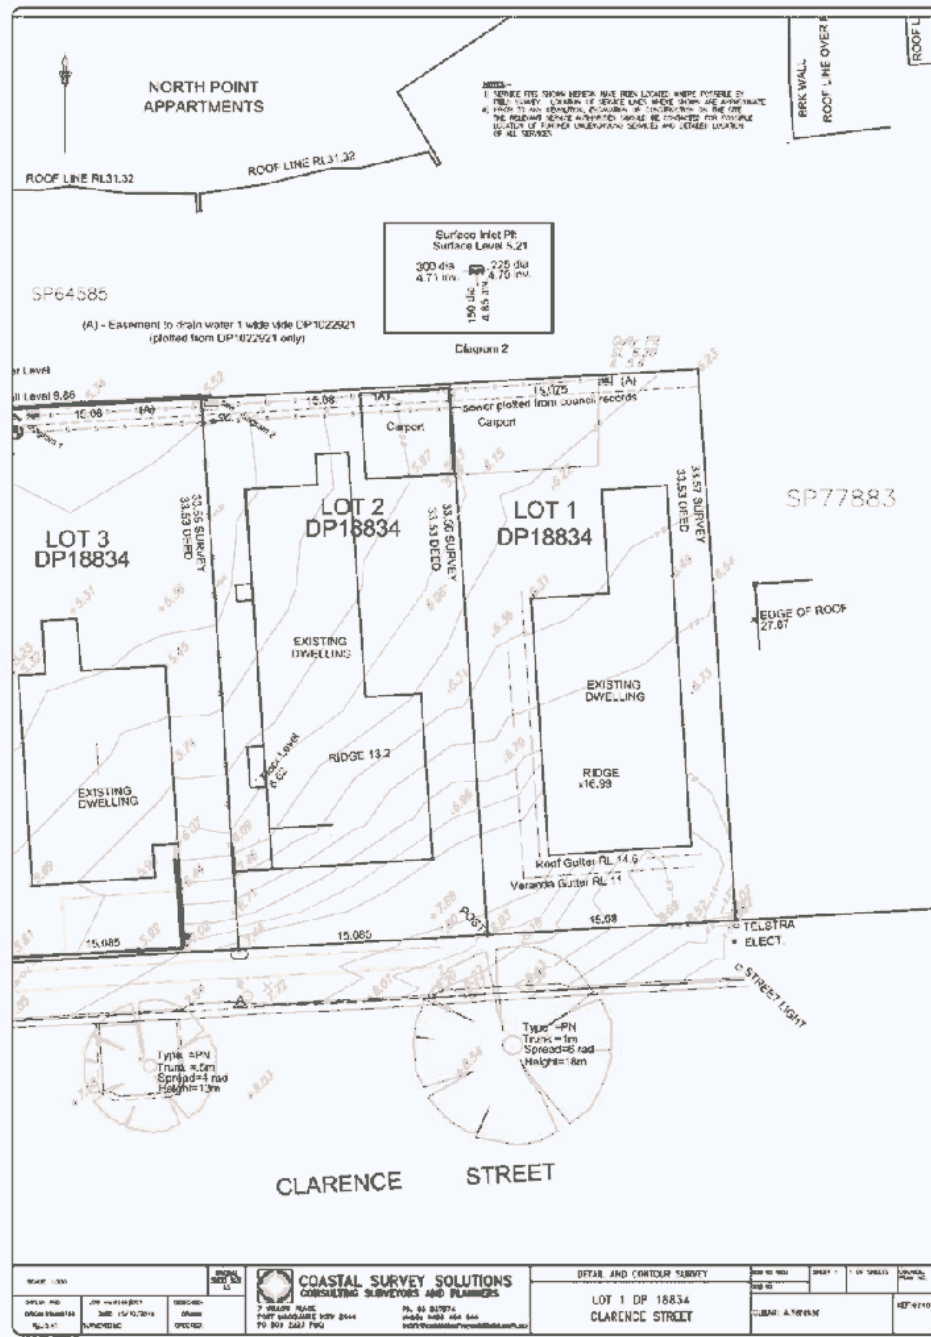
Current survey of the study site, showing details for 15 Clarence Street (Lot 1 DP 18834), as well as contour details for 17 (Lot 2 DP18834) and 19 Clarence Street (Lot 3 DP18834). Coastal Survey Solutions (2014).
